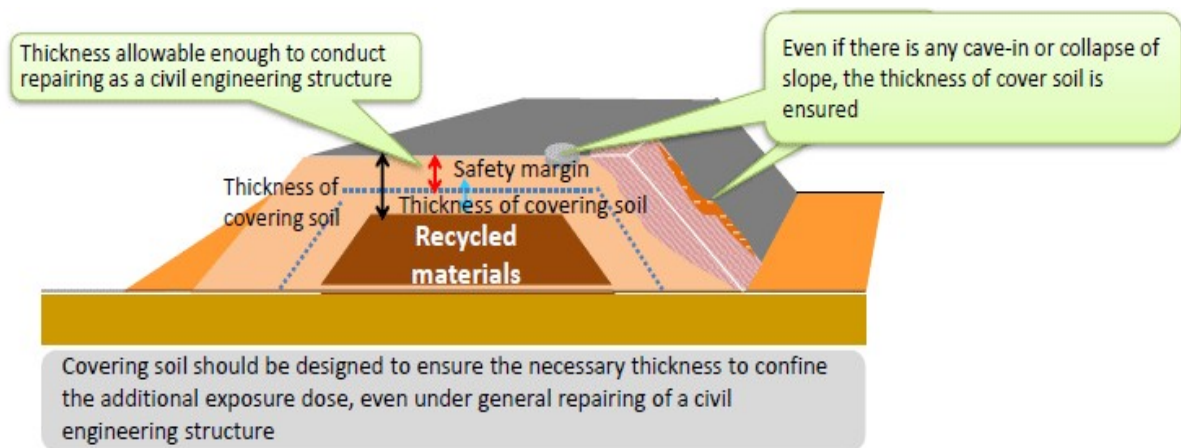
Scheme of recycling of low contaminated soil in the civil construction project (reproduced with permission).
